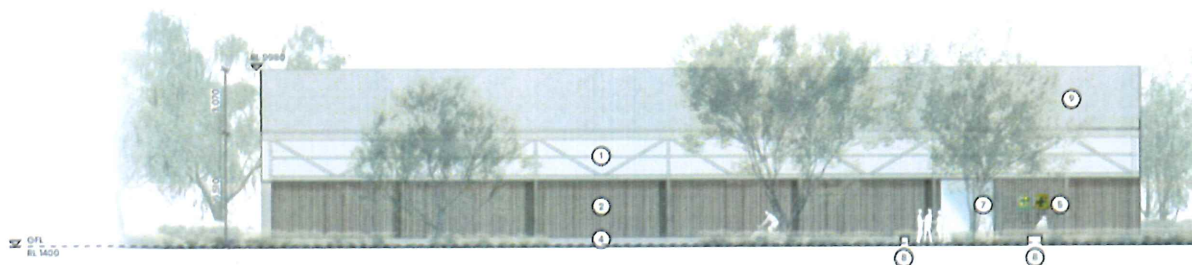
South elevation detailing proposed building materials (view from playground/family picnic area)
